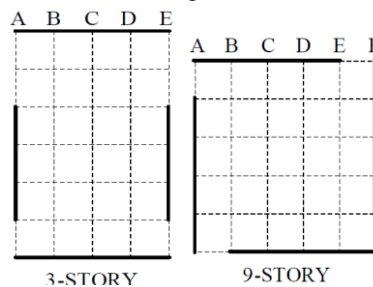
Layout of moment resisting frame for 3 and 9 storied SE model buildings.
